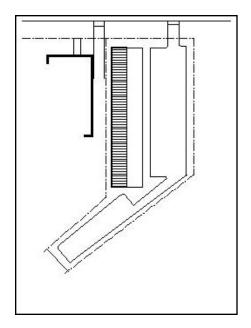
Unacceptable: Site plan of typical deep-lot residential development with no orientation to the street.
